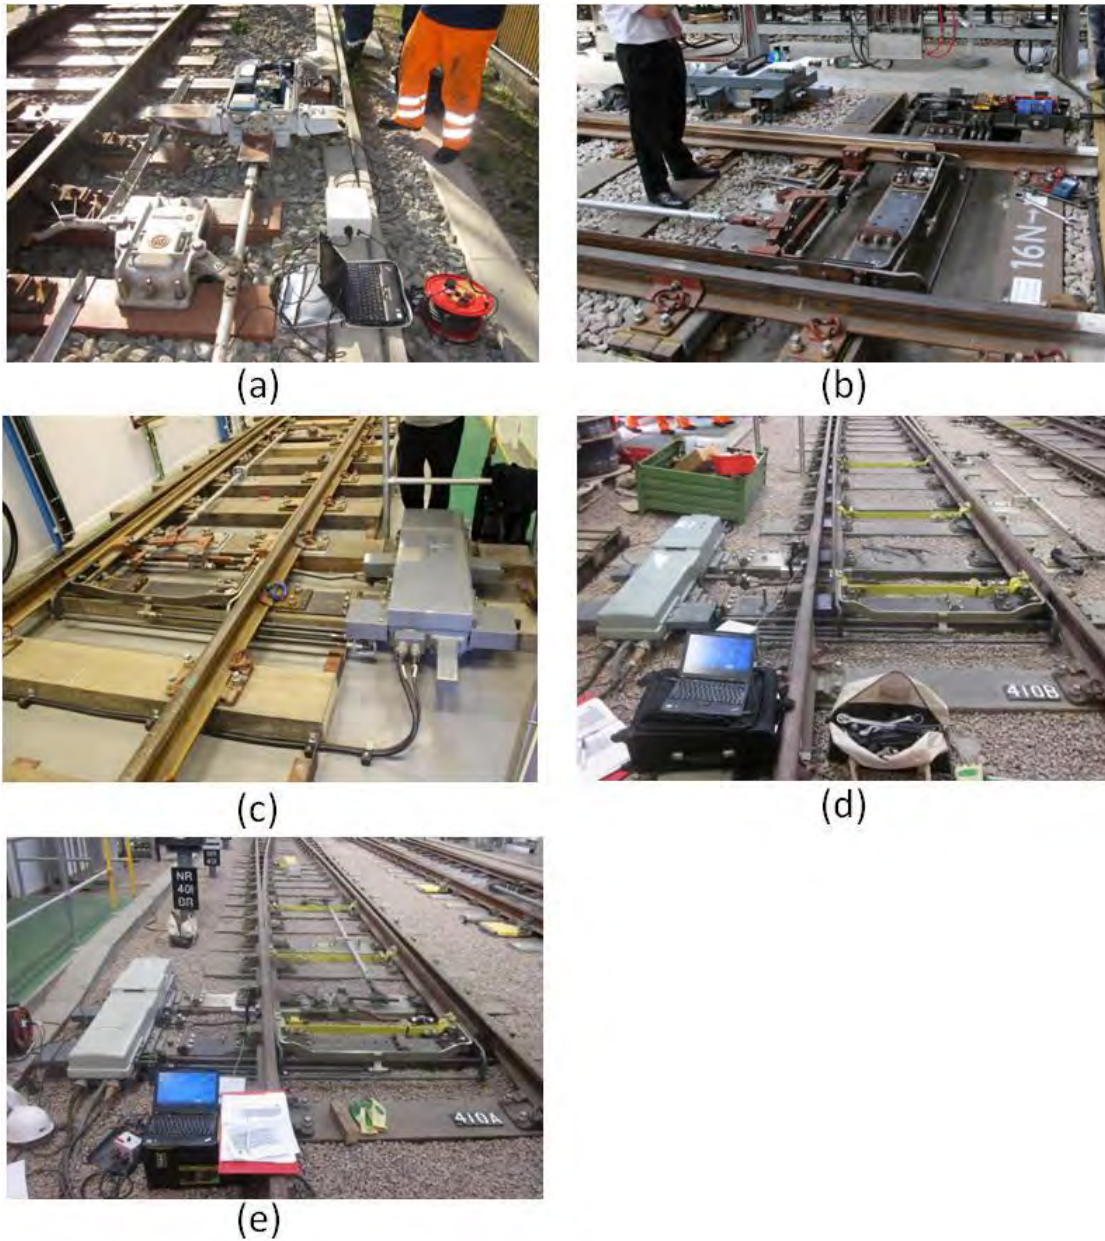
Photograph of (a) NTS-type point machine, (b) Surelock-type point machine, (c) M63-type point machine, (d) HW-type point machine 1 and (e) HW-type point machine 2
